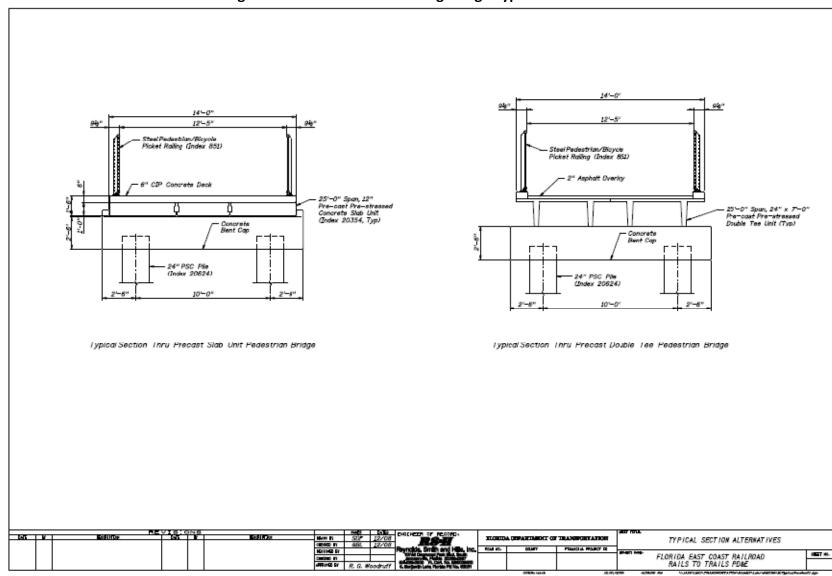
Low Level Crossing Bridge Typical Sections
